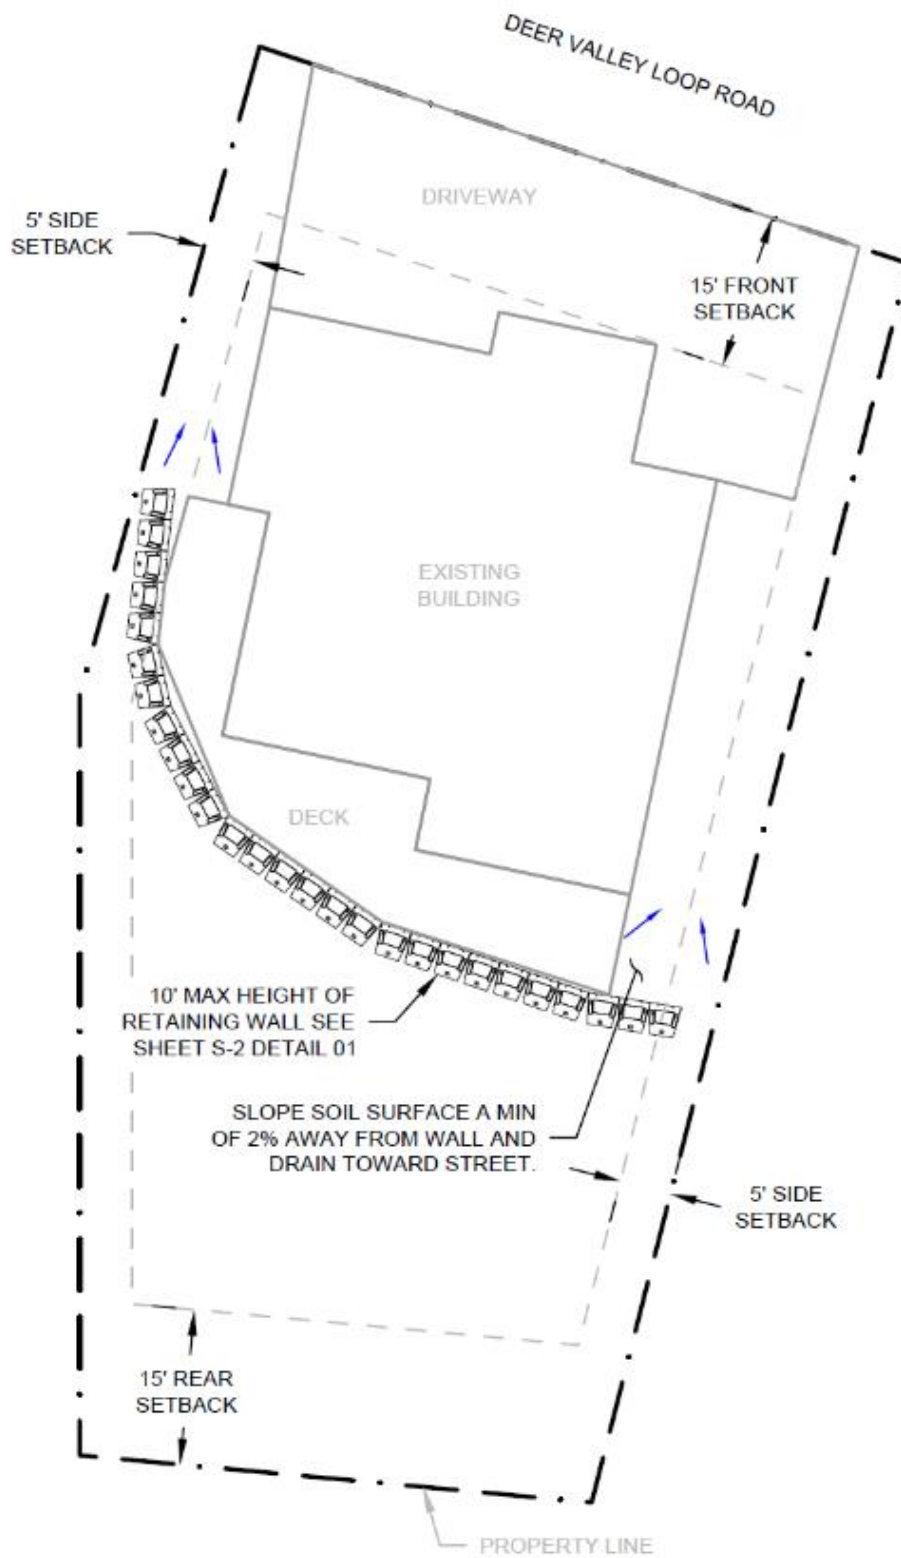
Applicant's submittal (Exhibit B) showing proposed new concrete block retaining wall to replace the failing wood retaining wall in the rear of the structure at 430 Deer Valley Loop.
